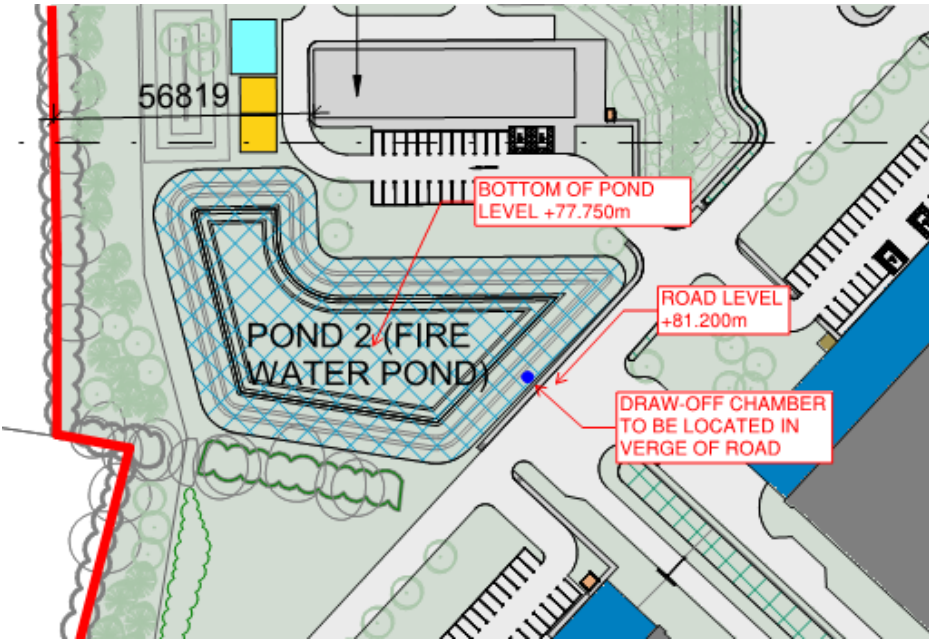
Extract from Site Layout Indicating Fire Pond Location
